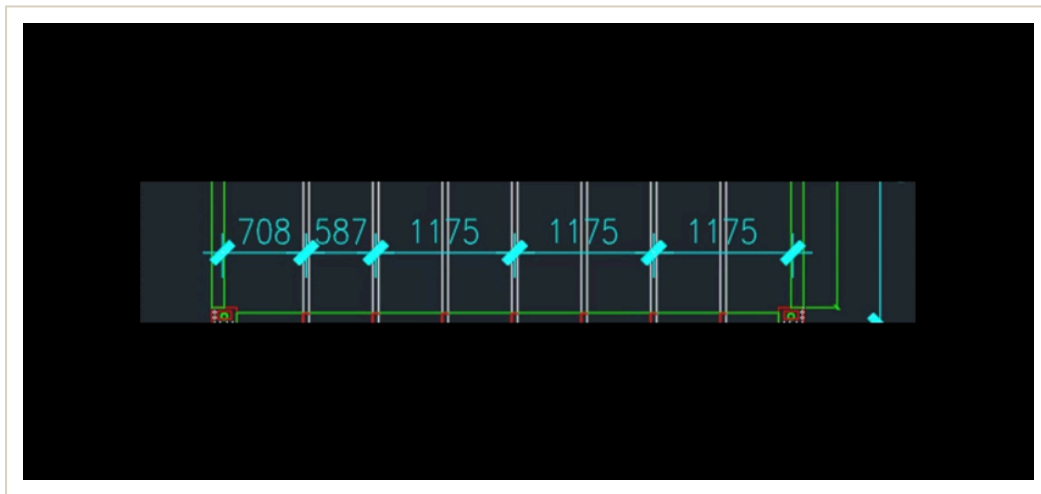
· 3 × 5 FLOOR EXAMPLE (NOT 3 × 6!) 3 × 5 board layout: 708 mm + 587 mm + 1175 mm + 1175 mm + 1175 mm cement boards.
